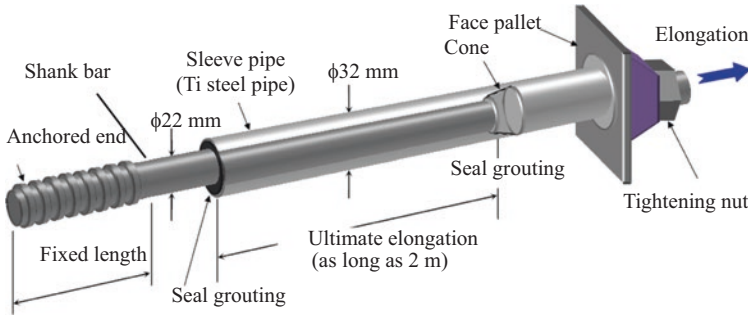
Schematic of the three-dimensional view of the NPR bolt (He et al. 2014)
